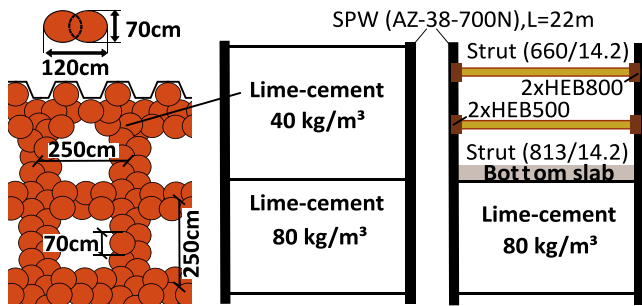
Plan view and cross-section of E02 Central station deep excavation of West Link project.
